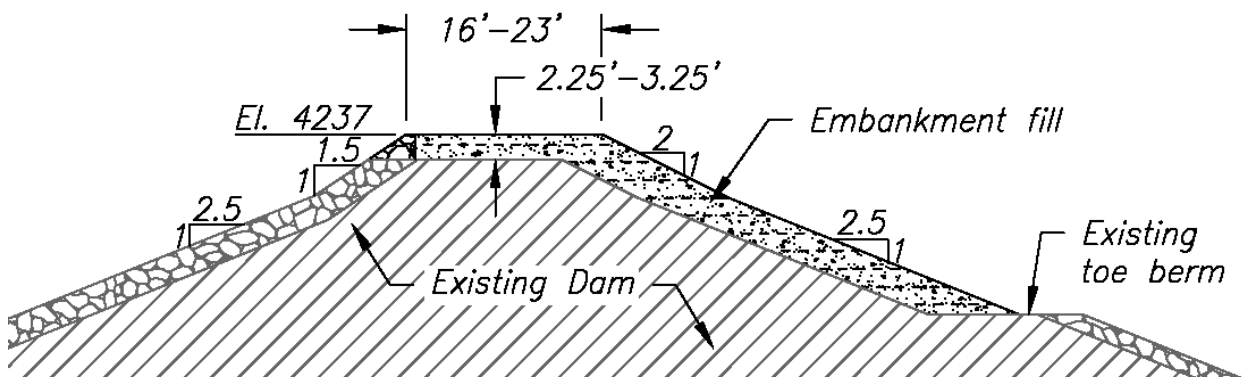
Typical cross section of crest raise from Station 60+00 to 400+00
